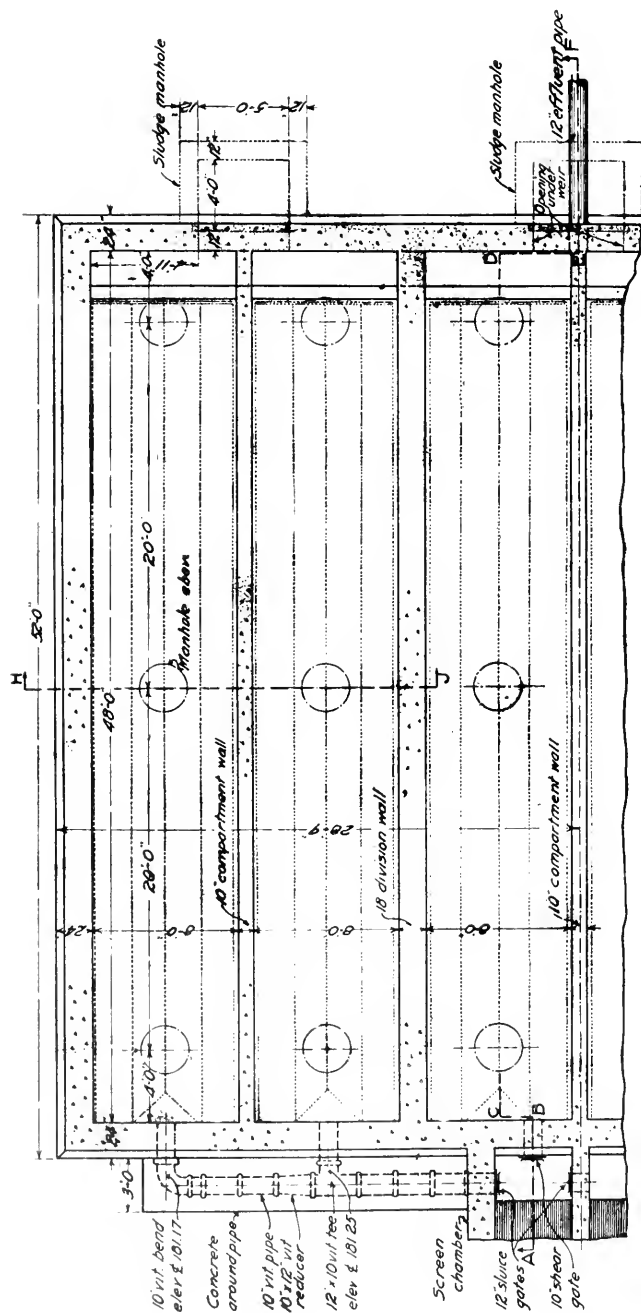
GENERAL PLAN OF ONE-HALF OF MAIN SETTLING TANK.
